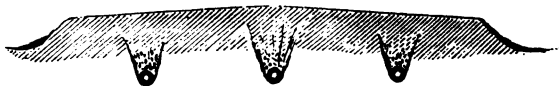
Cross Section of Road, with three Pipe Under-drains, covered with Gravel.
